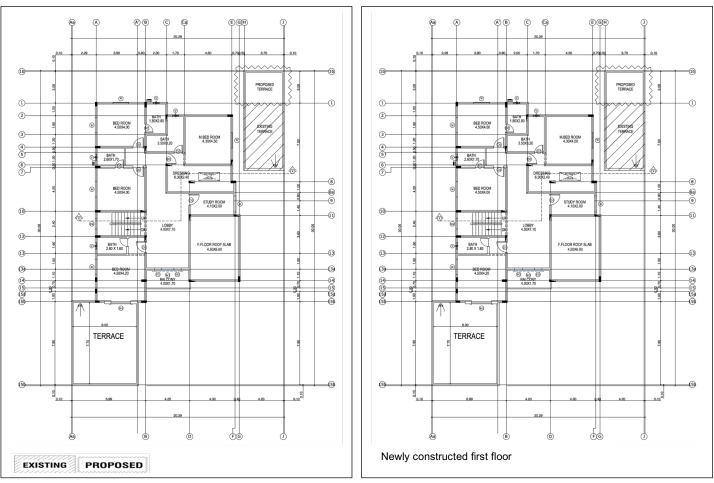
Villa layout before retrofit showing existing structure and proposed retrofit
